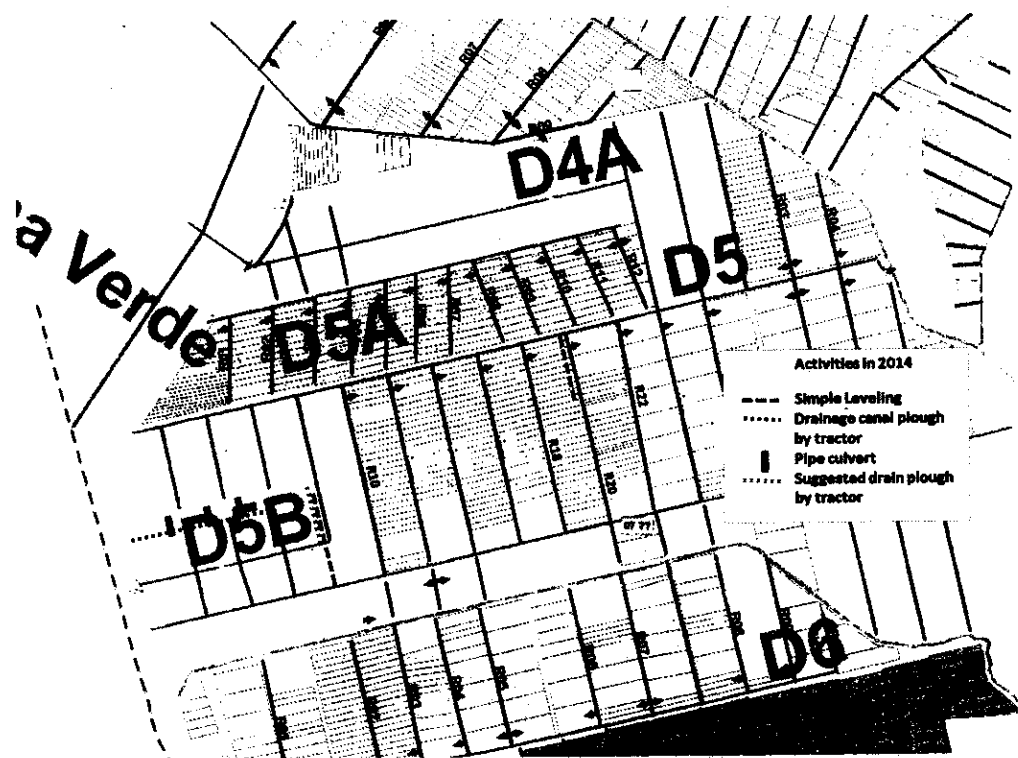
Simple Leveling and drainage improvement works in D5 area in 2014
